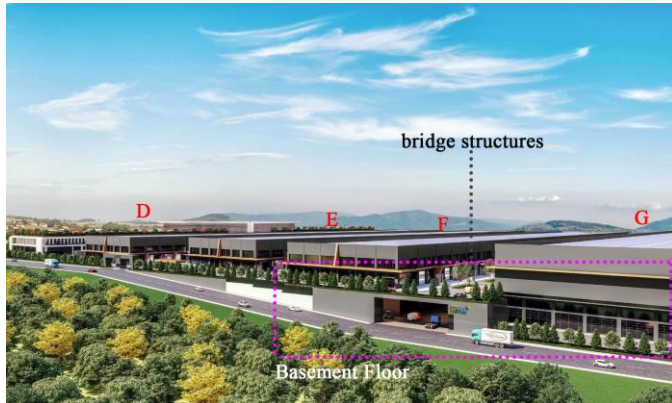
Natural Slope, Basement Floors and Bridge Structures
